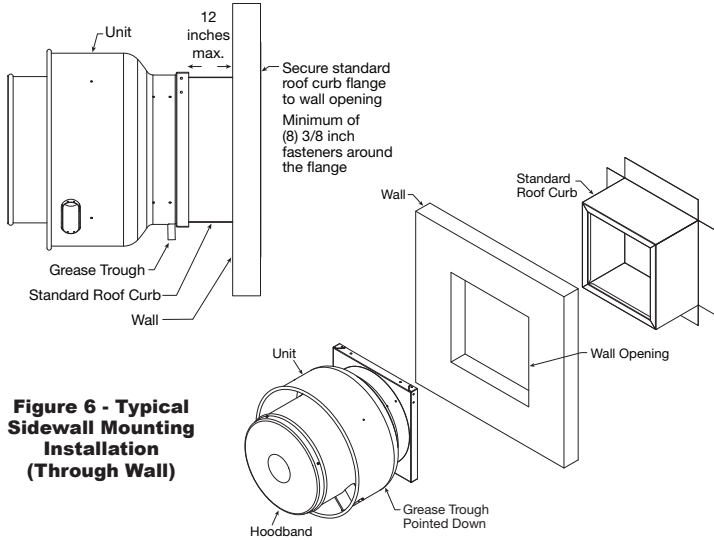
Typical Sidewall Mounting Installation (Through Wall)
